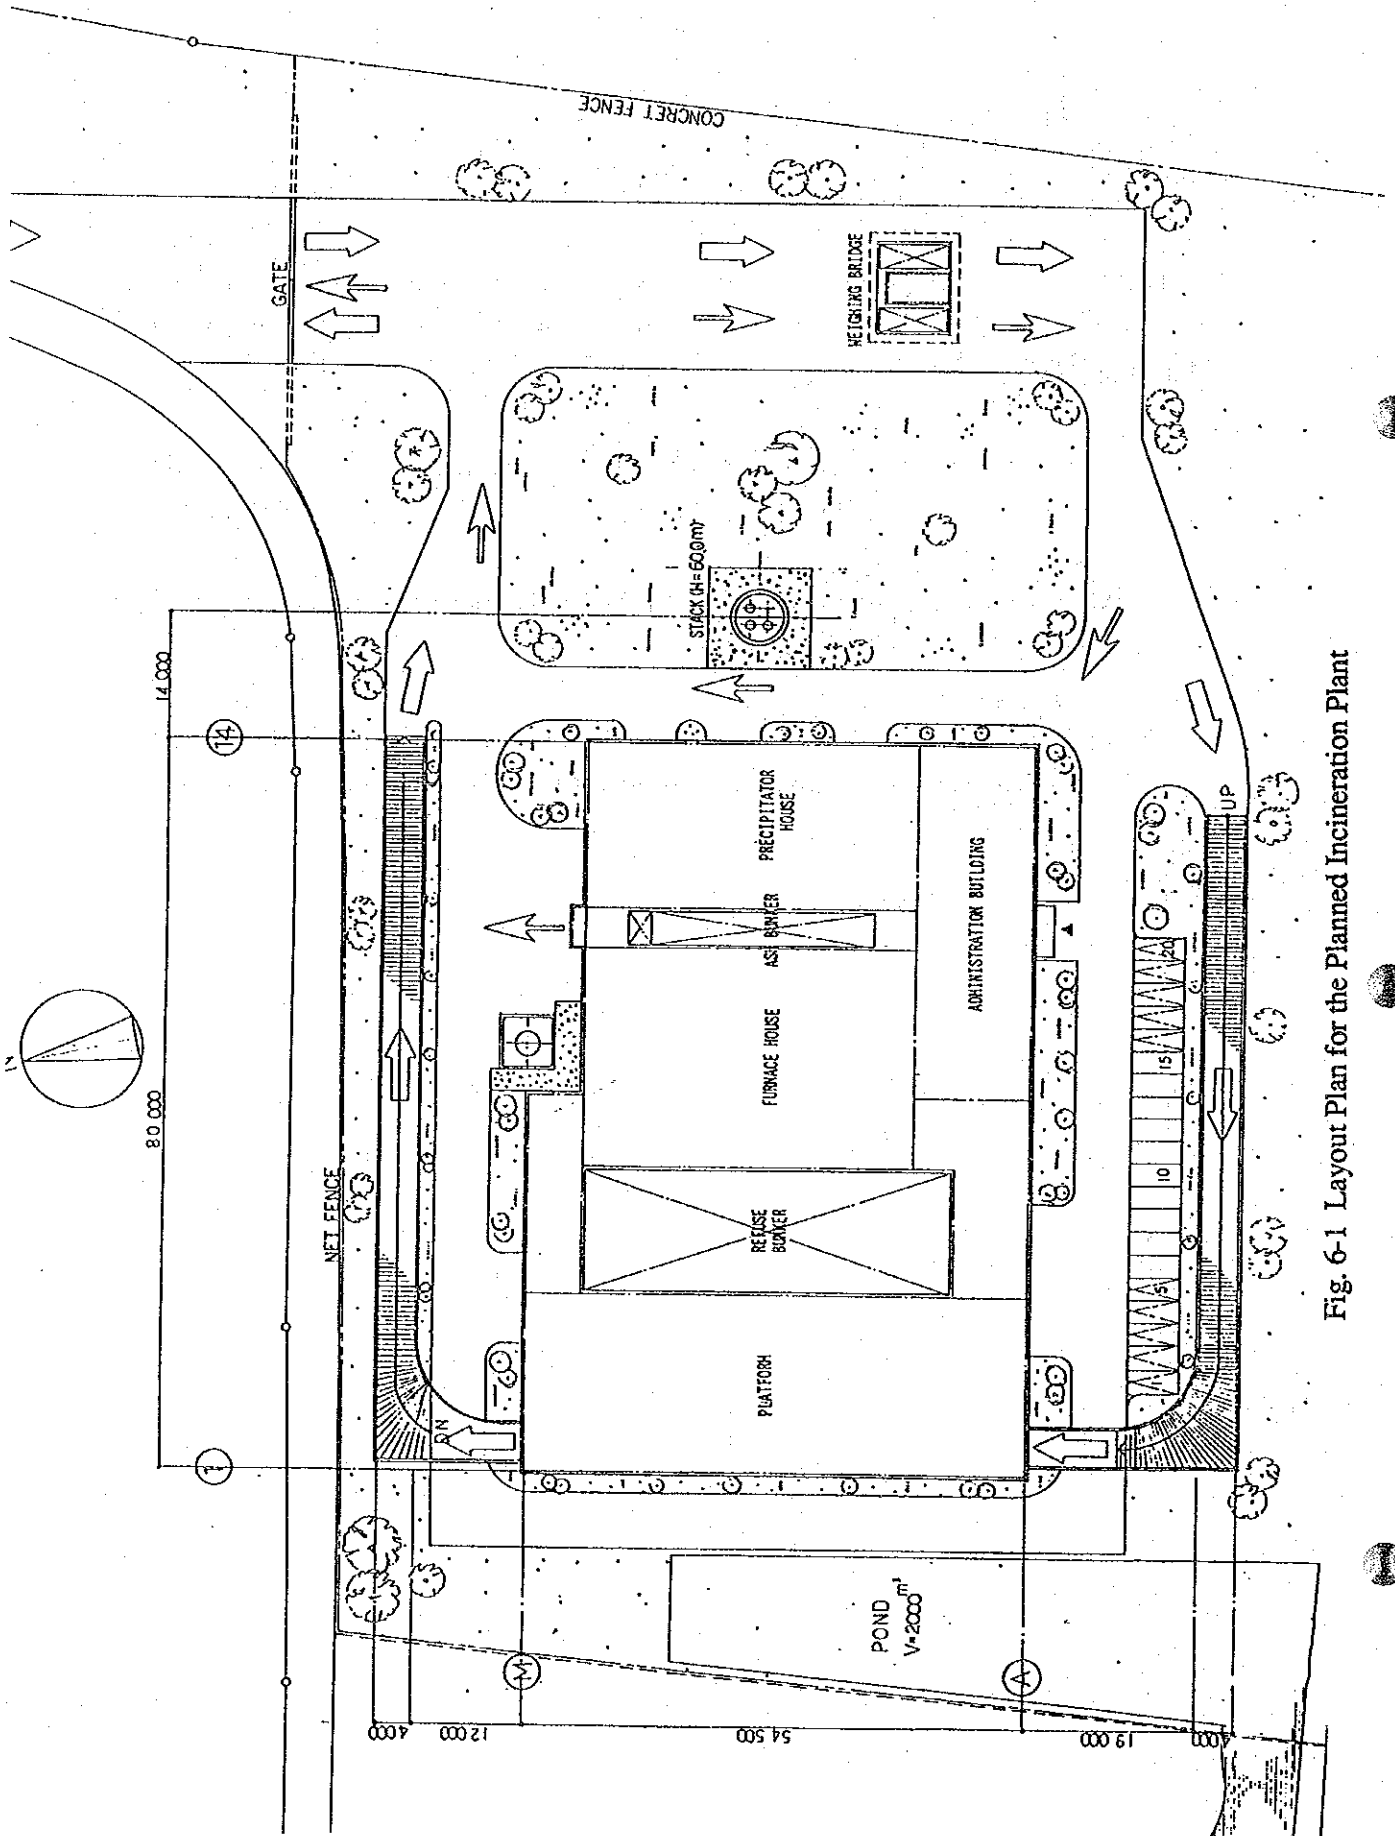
Layout Plan for the Planned Incineration Plant
